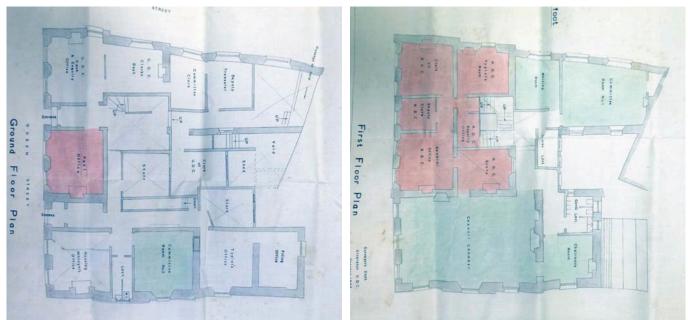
(left): Ground floor plan of the town hall, dated 1953 (CAC(B) BSUDU/C/Box 2/Bundle 1/173 1953)
